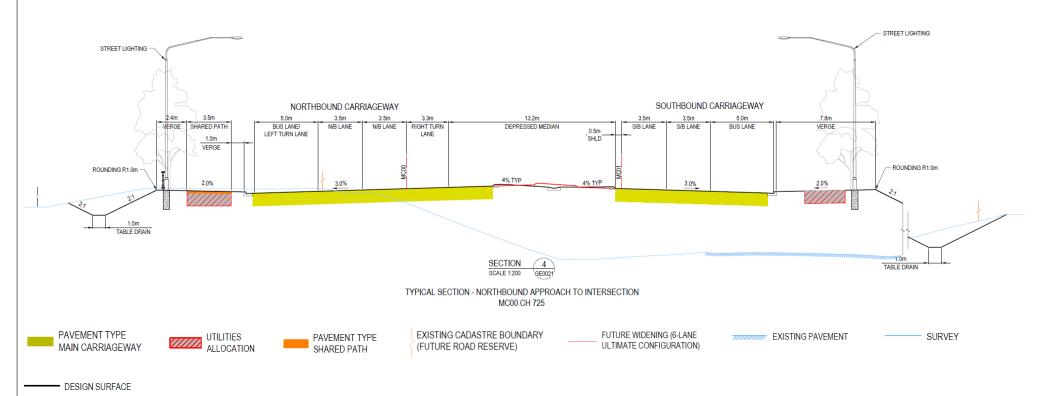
Typical cross section of Richmond Road Upgrade at its highest point, the approach to the signalised intersection
